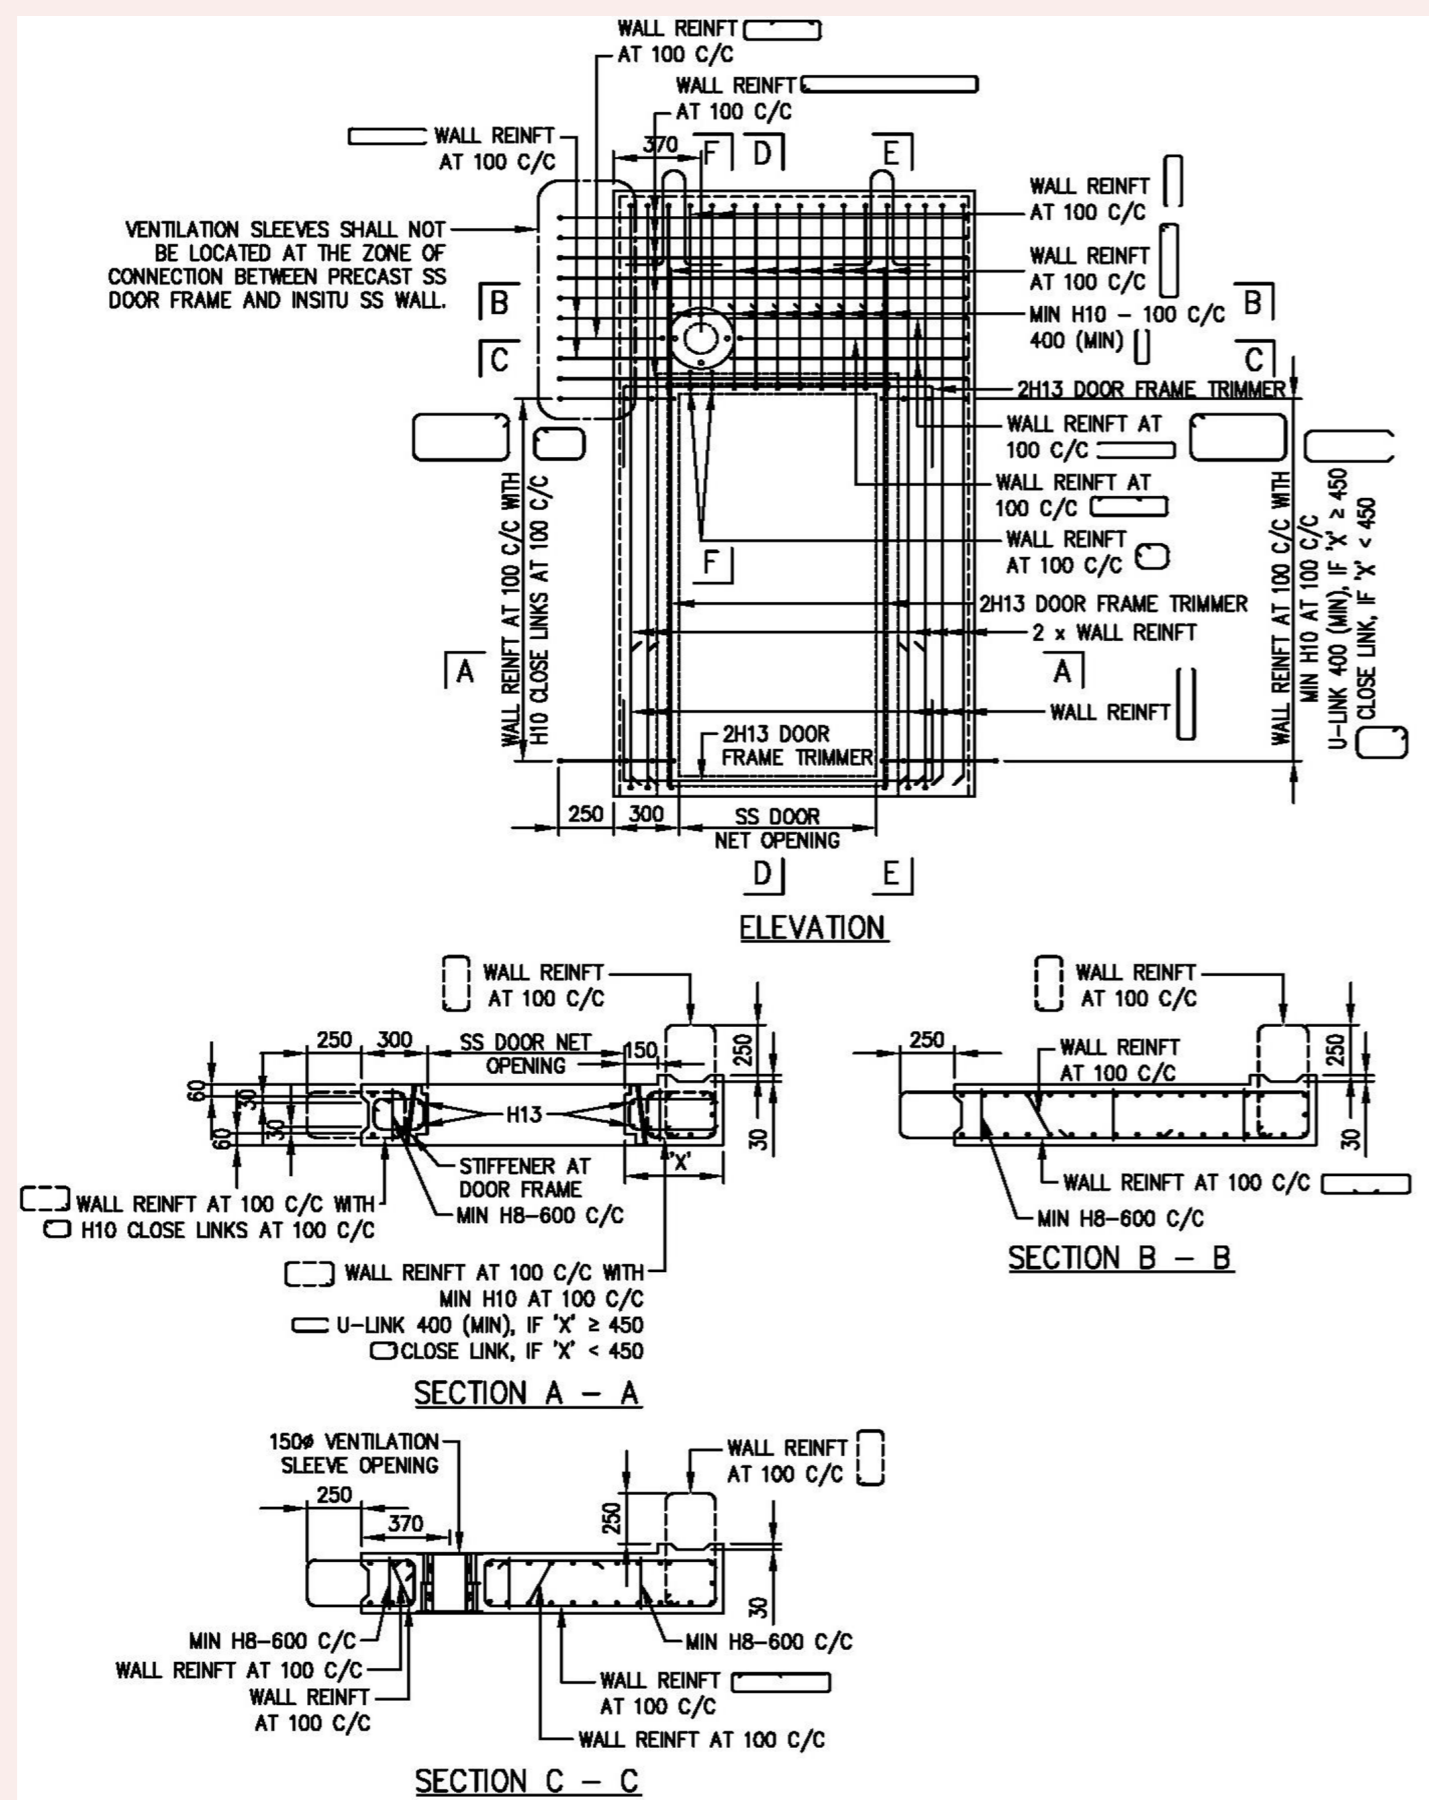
(j): SECTIONS OF PRECAST SS DOOR FRAME PANEL WITH VENTILATION SLEEVE ALONG ITS SIDE (TYPE 2)
